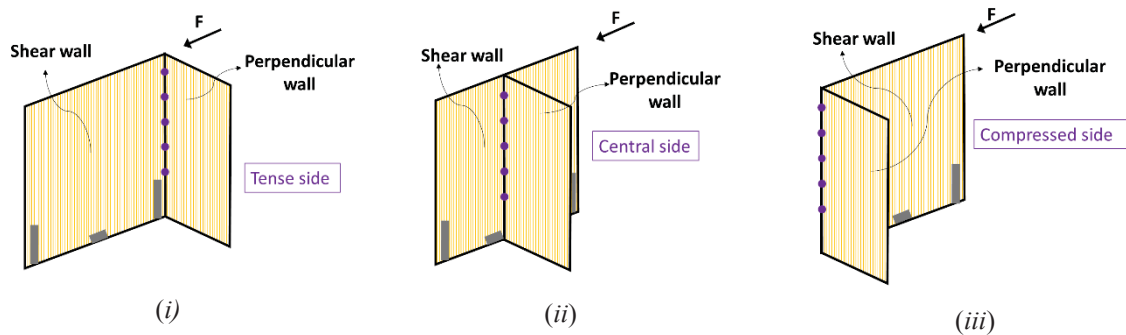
Position of perpendicular wall respect to shear wall: tense side (i), central side (ii) and compressed side (iii).
